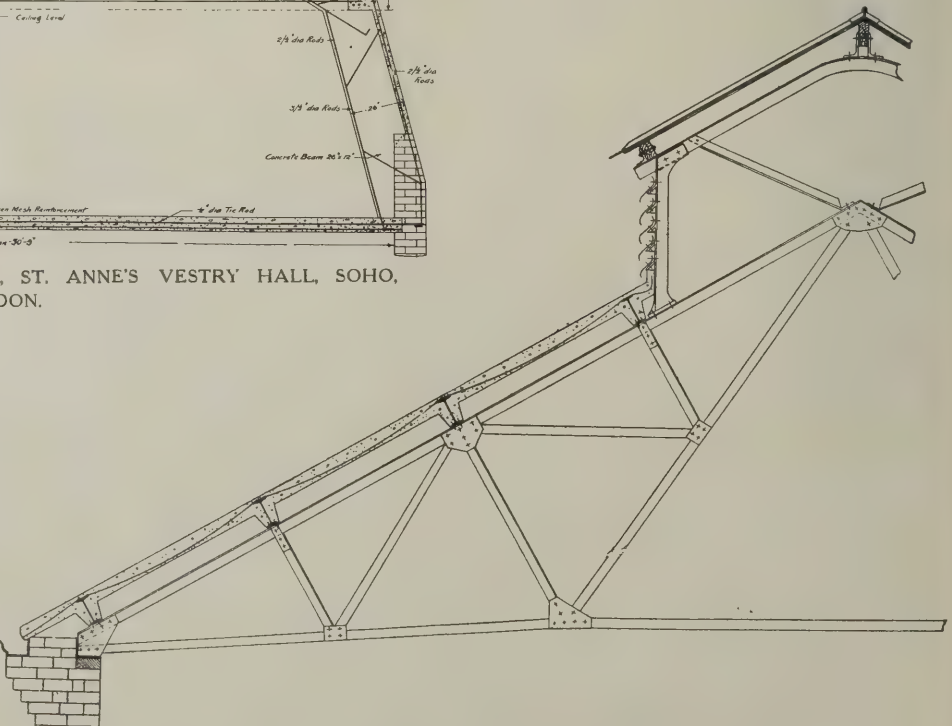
APPLICATION OF REINFORCED CONCRETE ROOF TO ORDINARY STEEL ROOF TRUSS.
